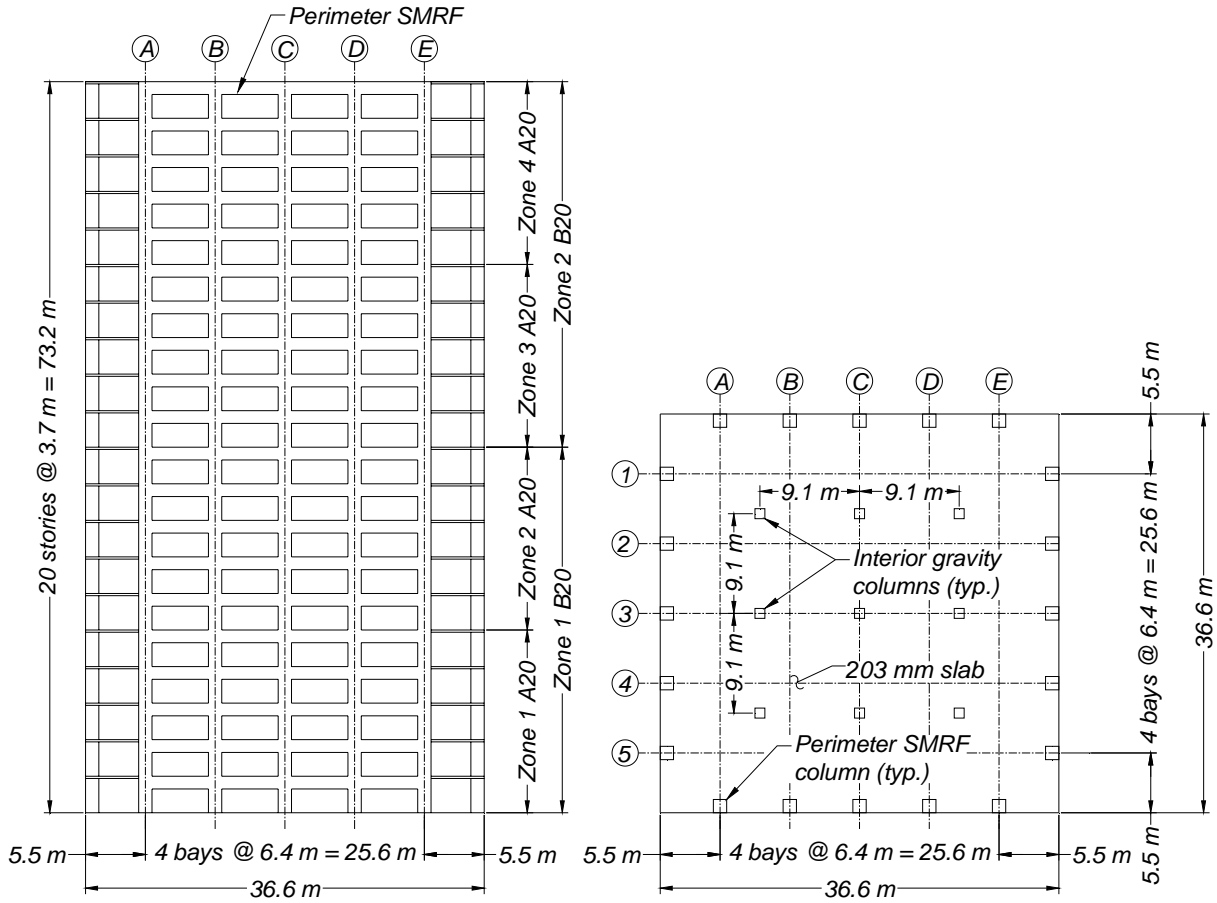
(Left) Elevation and (Right) floor plan of buildings considered.
